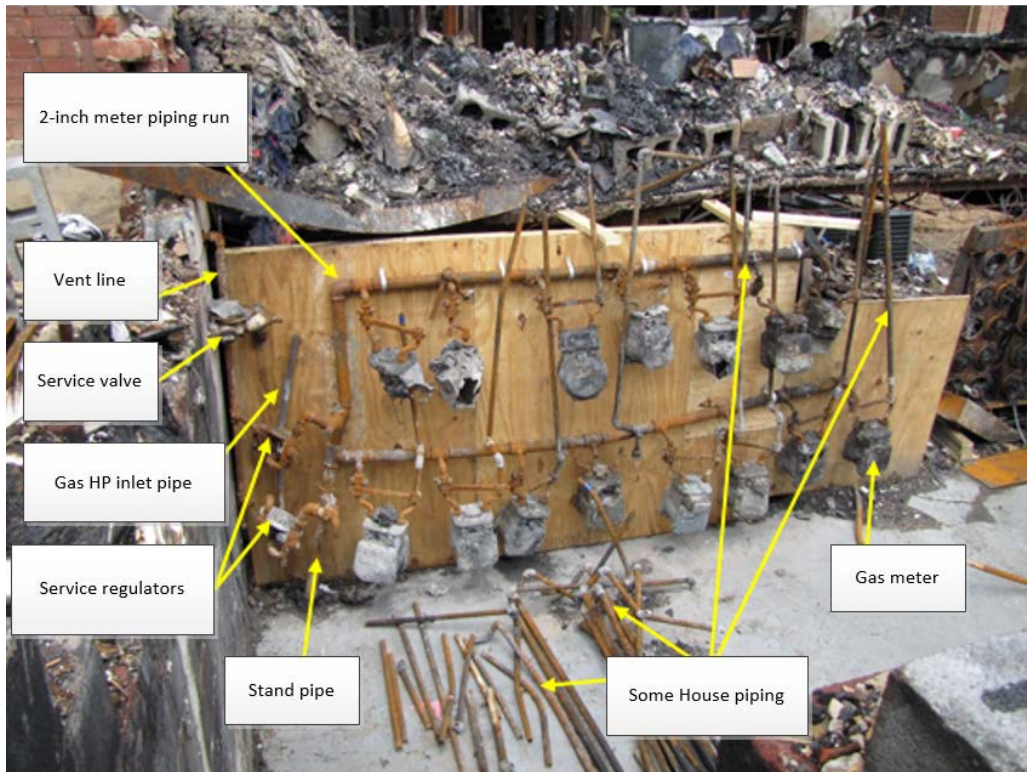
ATF reconstructed 15 meters of piping of gas services in the basement of 8701 Arliss Street, Silver Spring.
